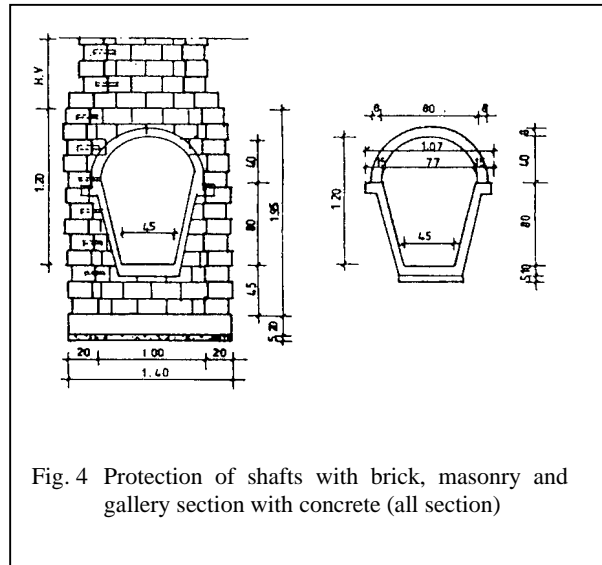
Protection of shafts with brick, masonry and gallery section with concrete (all section)
